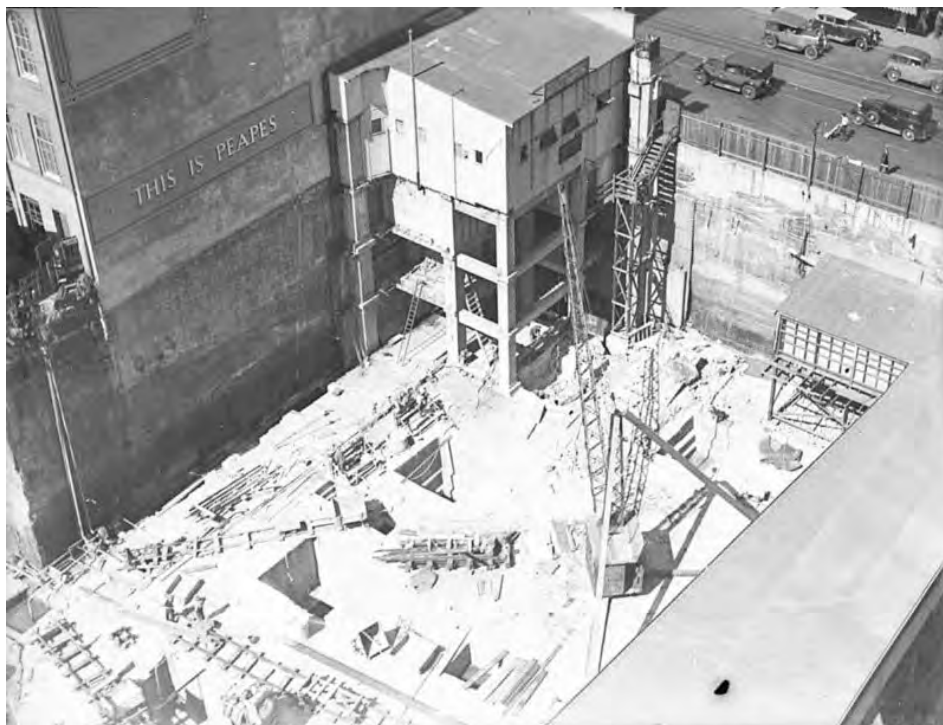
Excavation for the proposed Plaza Hotel, 1935. This image shows the basement of the Plaza Hotel. On the right of the image can be seen the Hunter Connection subway with its distinctive dog-leg to go under George Street. The ramp down to Wynyard Station has not yet been completed, but the temporary single-storey Plaza Hotel bar is shown fronting George Street. (Source: City of Sydney Archives)
